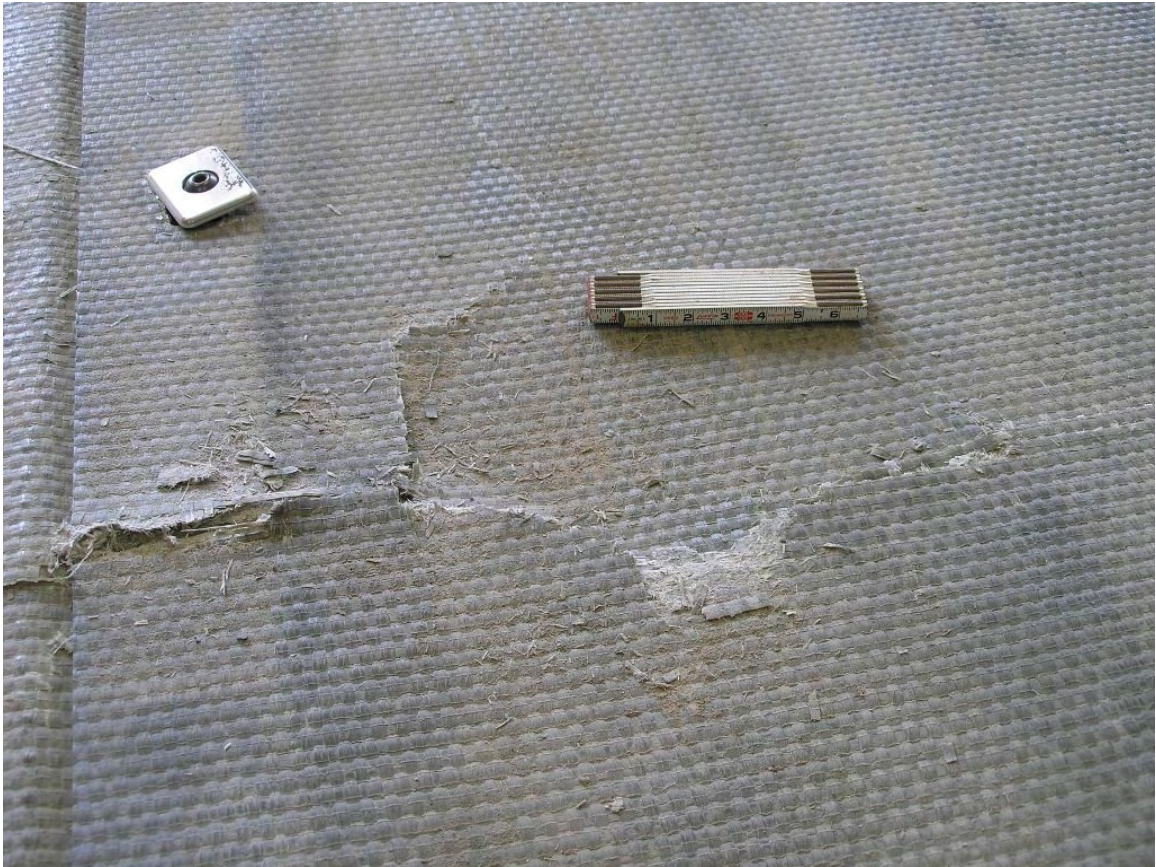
Typical Connection Pin and Mat Damage of the ACE-Mat™ on the CH Test Section
